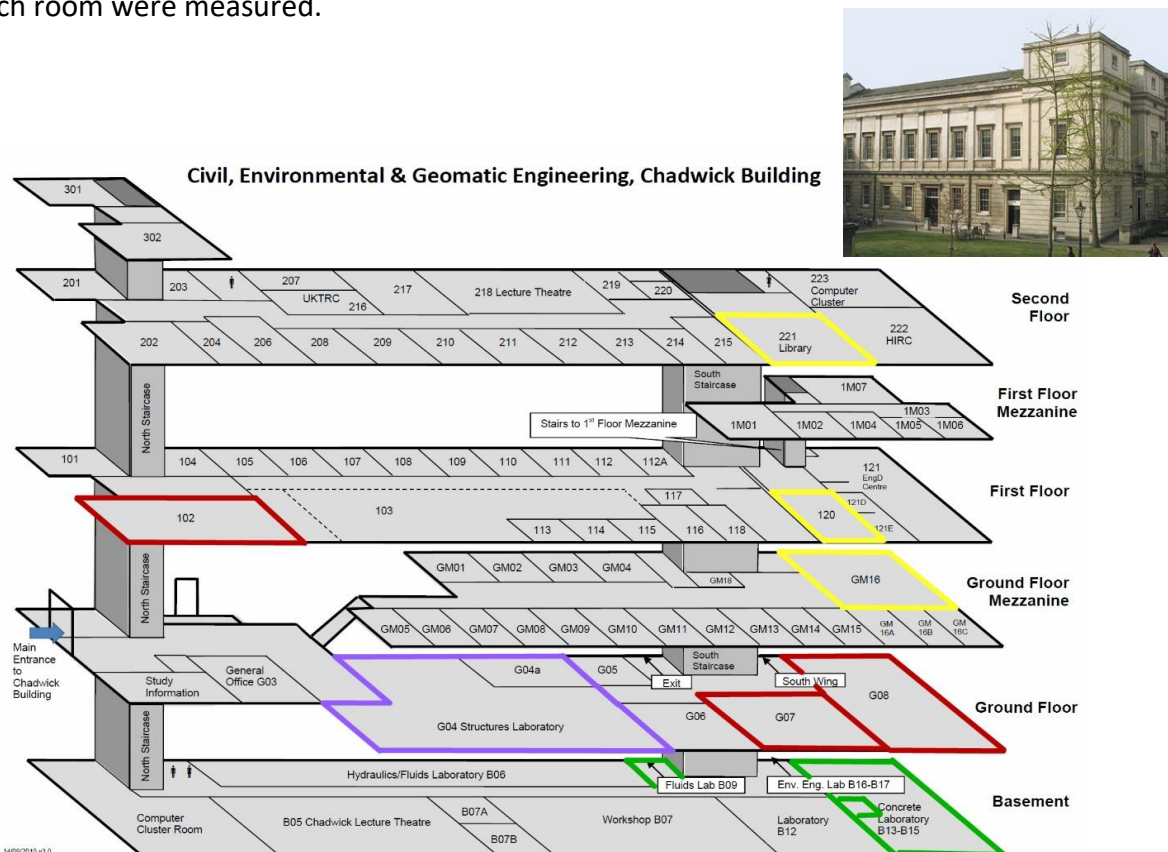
Chadwick Building photo and floor plan (from CEGE website) with tested rooms highlighted (The rooms highlighted in RED are classrooms, YELLOW are offices, PURPLE is a multi-functional open area which is used as an activity room, GREEN are laboratories, B09 Fluids Lab cannot be seen fully in this diagram)
